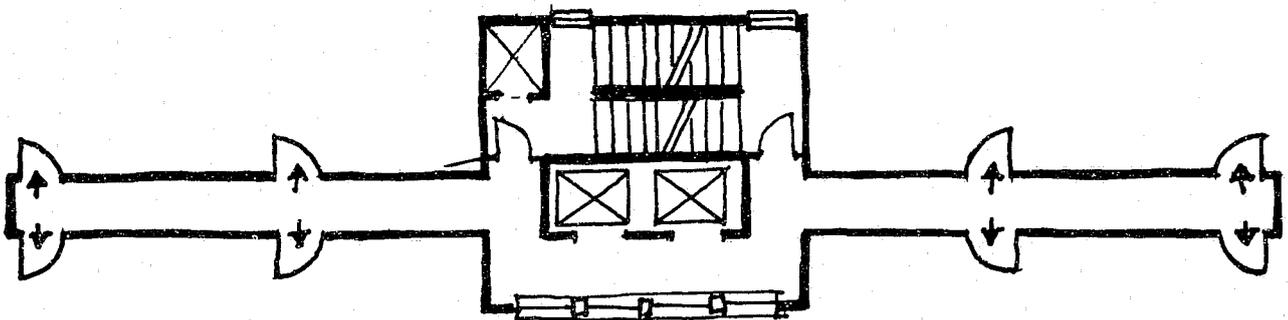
Van Dyke Houses, New York. Floor plan. The fire stair doors seal off the corridor from noises coming from other floors, thereby inhibiting casual audio surveillance.
